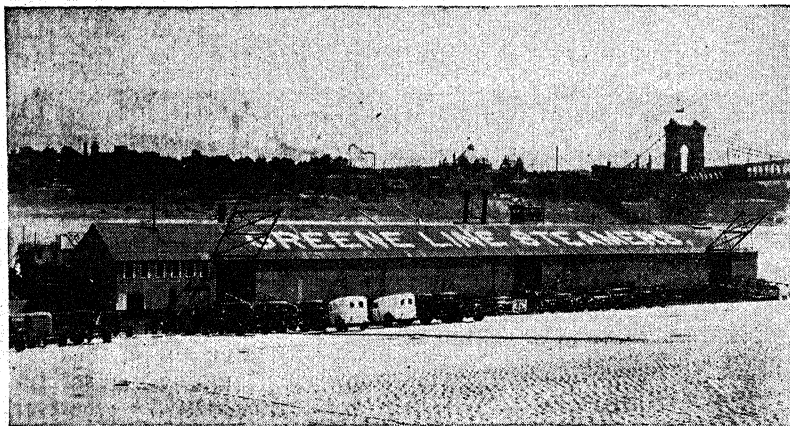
Wharfboat built by arc welding of steel salvaged from six obsolete barges.
